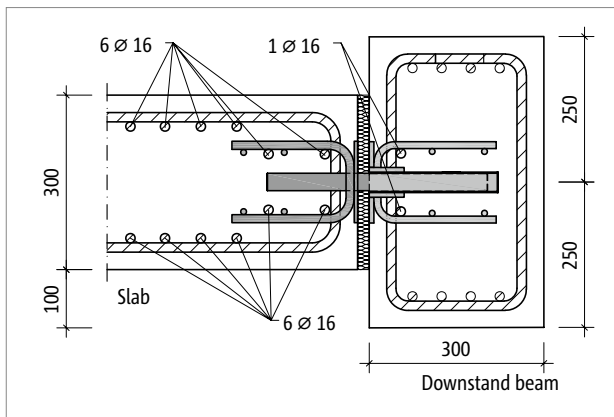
Section through floor-downstand beam connection showing reinforcement set-up
